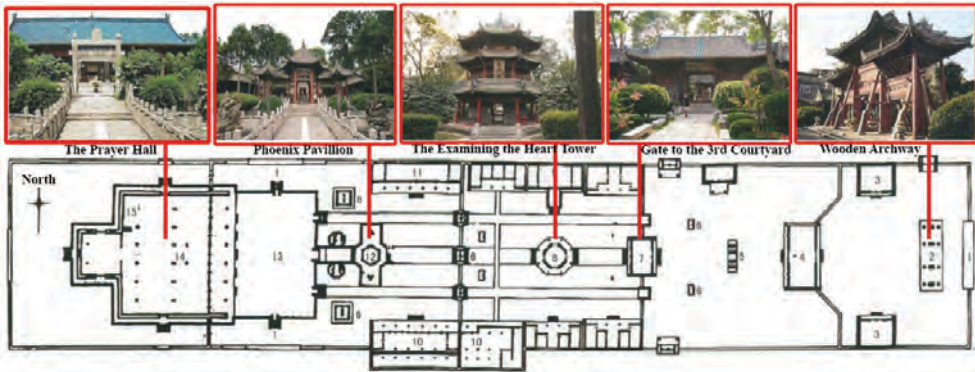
The layout of the Great Mosque of Xi'an and its key buildings/structures. (Fan, 2013)
